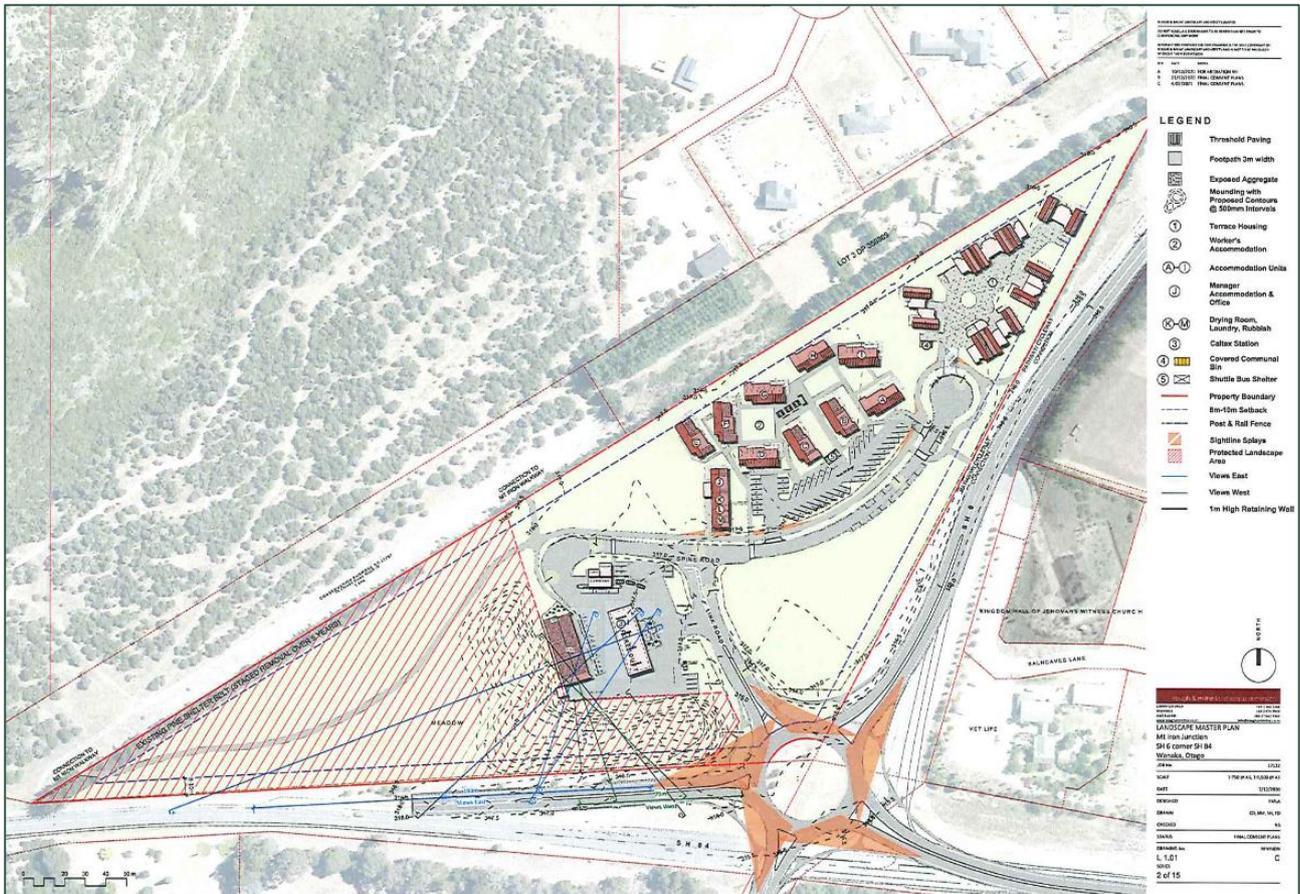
Master Plan for the Mt Iron Junction site authorised under RM181471
